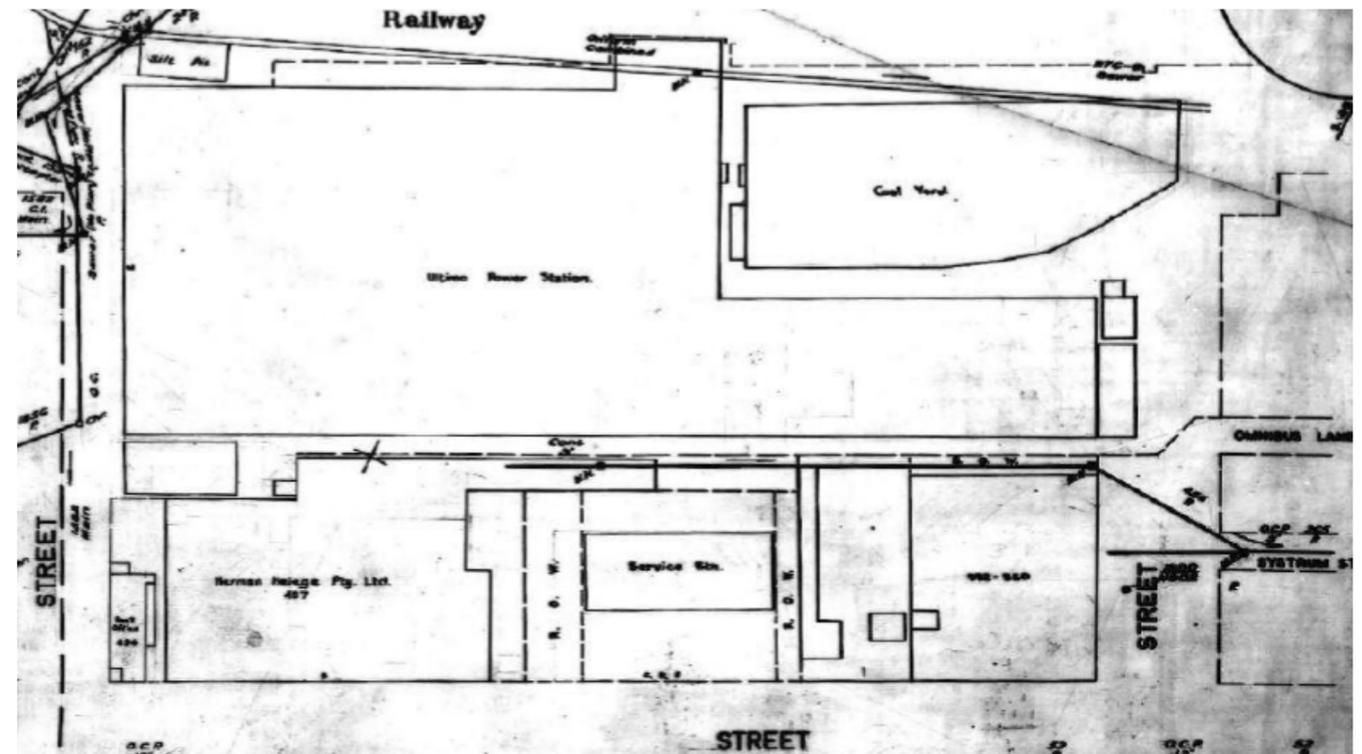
1963 plan indicating building at 552-556 Harris Street, corner of Macarthur Street (Source: Sydney Water archive plan DS3725 (2))
